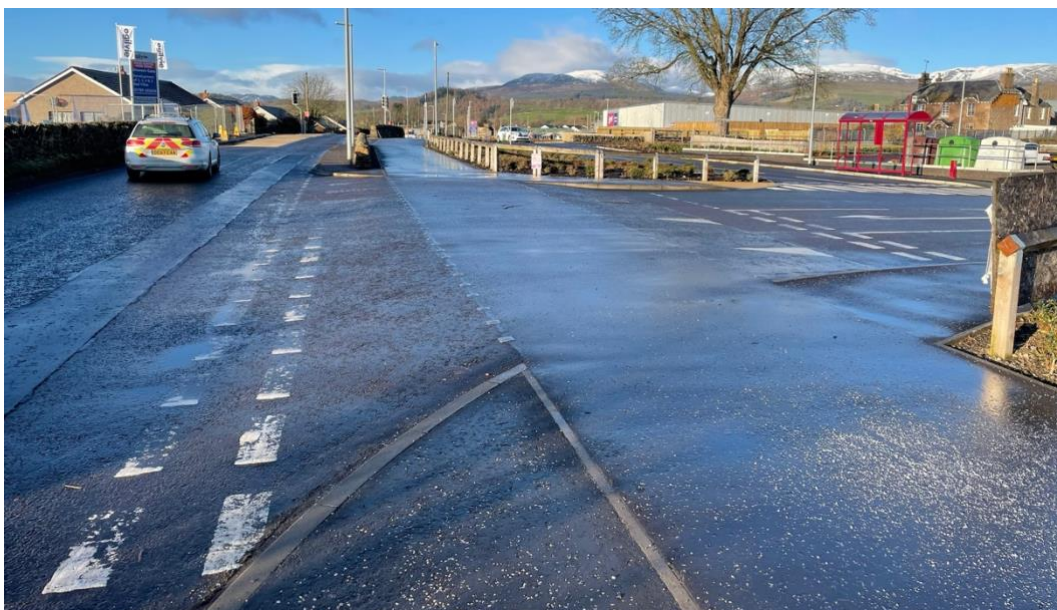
Use of double give way markings and a raised continuous footway on the route to a primary and secondary school on Broich Road in Crieff © Perth & Kinross Council
